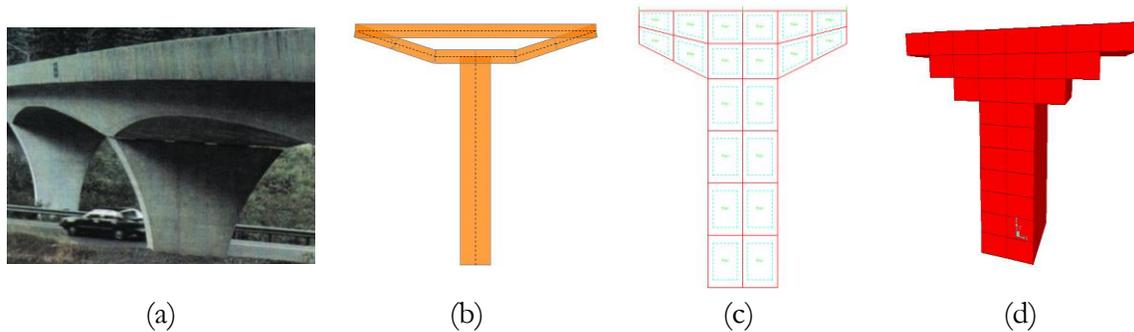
(a) Bridge Pier (b) Beam Model (c) Shell Model (d) Solid Model
